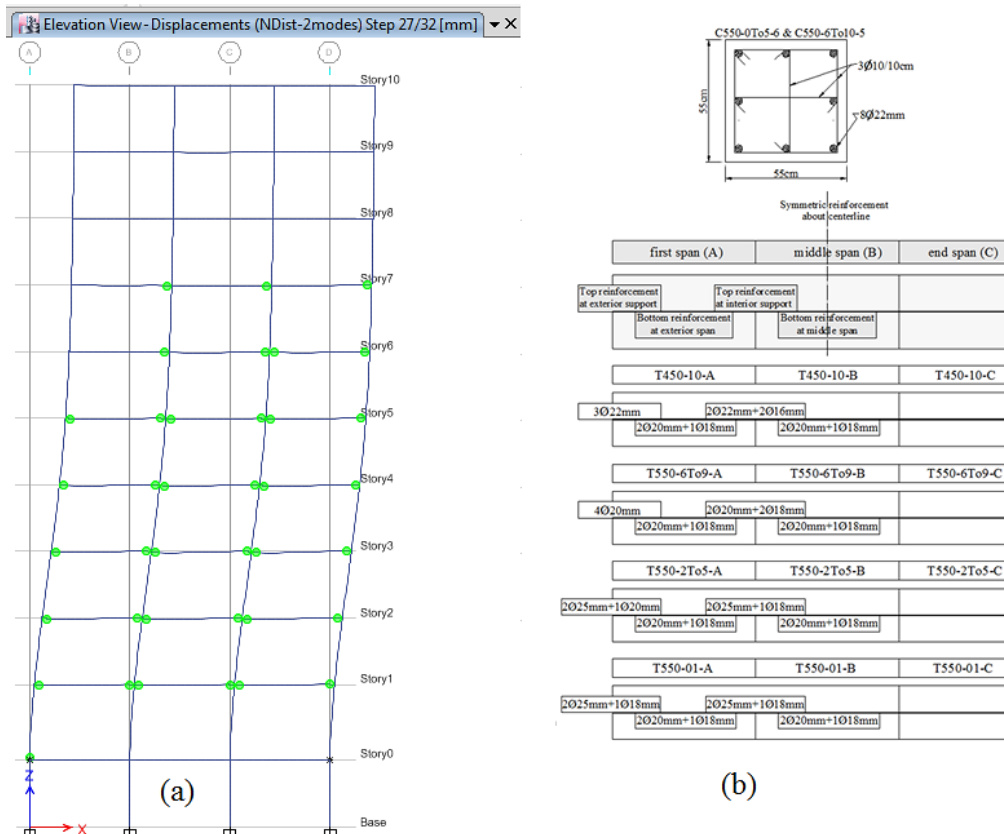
Archetype model frame of 6m bay width and ten stories height; a) formation of the only plastic hinge of columns started, b) the used reinforcements in columns and beams
